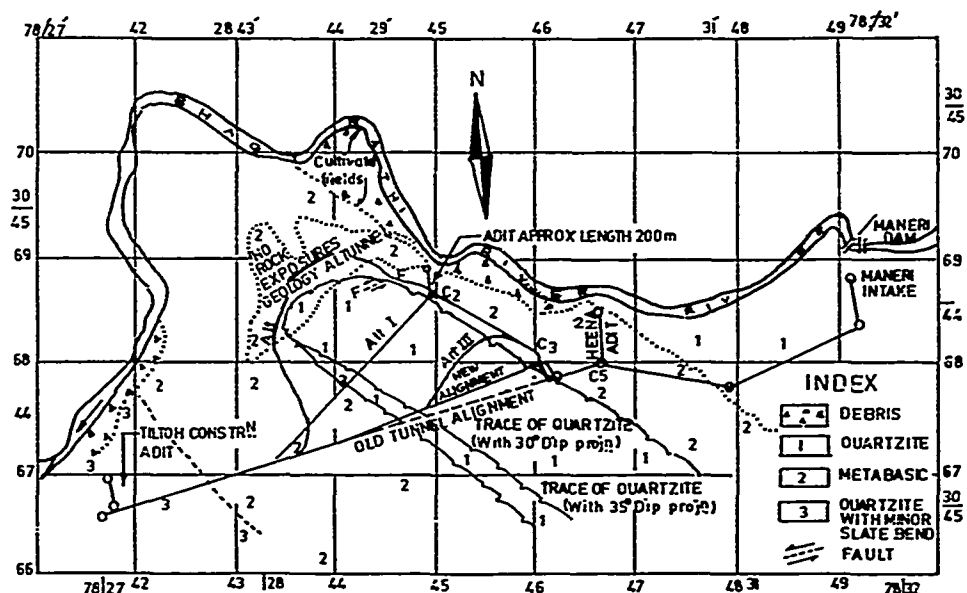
Plan at EL 1250 m Between Maneri and Tiloth Showing Alternative Tunnel Alignments
